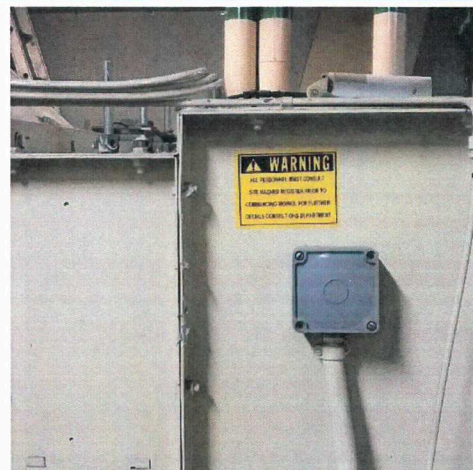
Level 23, Plant Room, Hot Water Unit - Mastic
